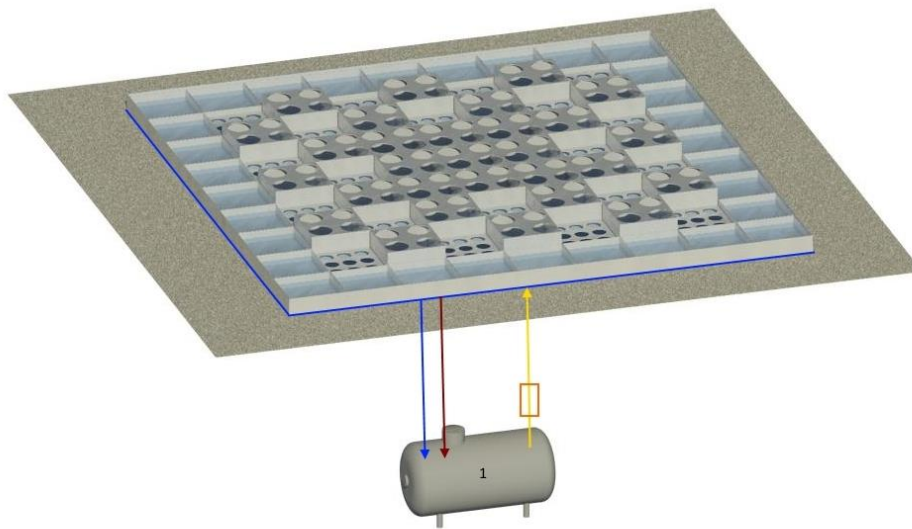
Store and bin store roof greening – water basin with installed HPL® Planter Modules
